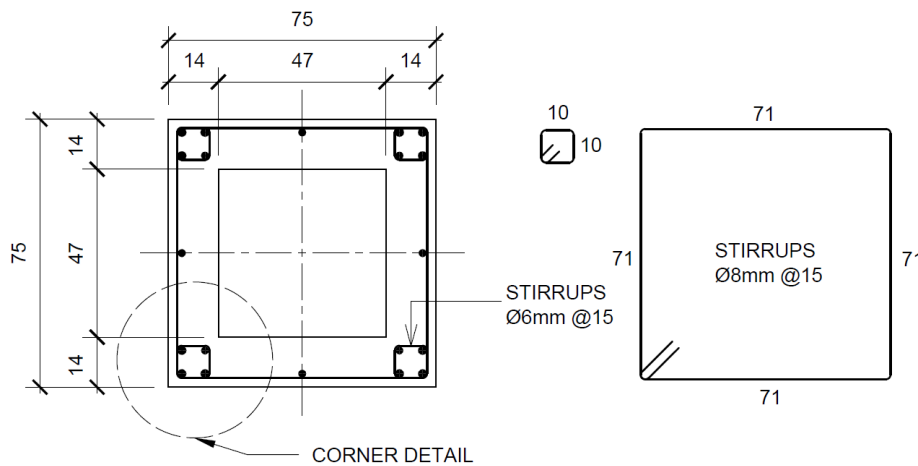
Column cross-section detail and reinforcement layout (units in cm).
